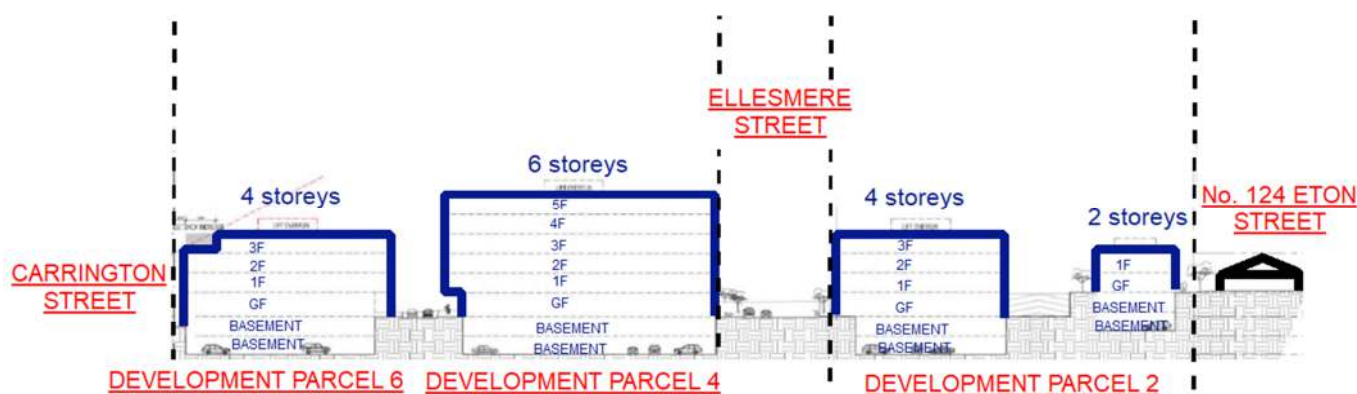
Cross Section Carrington Street through Ellesmere Street
